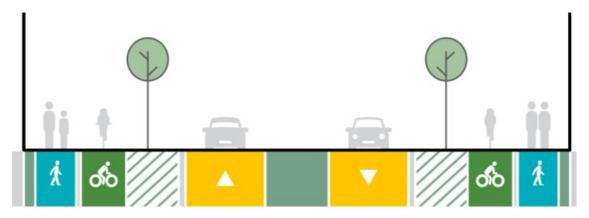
NOR W4 Spedding Road typical cross section - corridor and bridge
